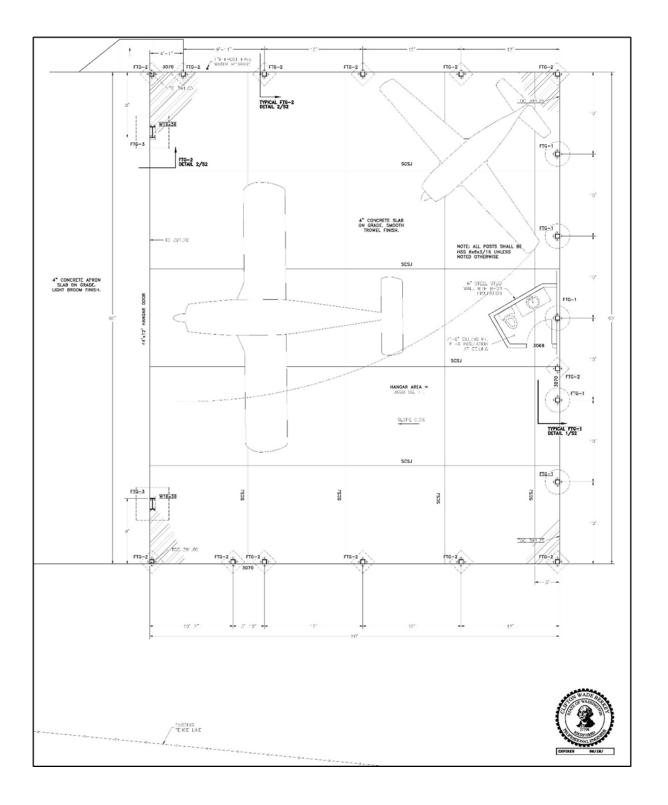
To Resolution 25-30 Hangar Plan SITE 4
